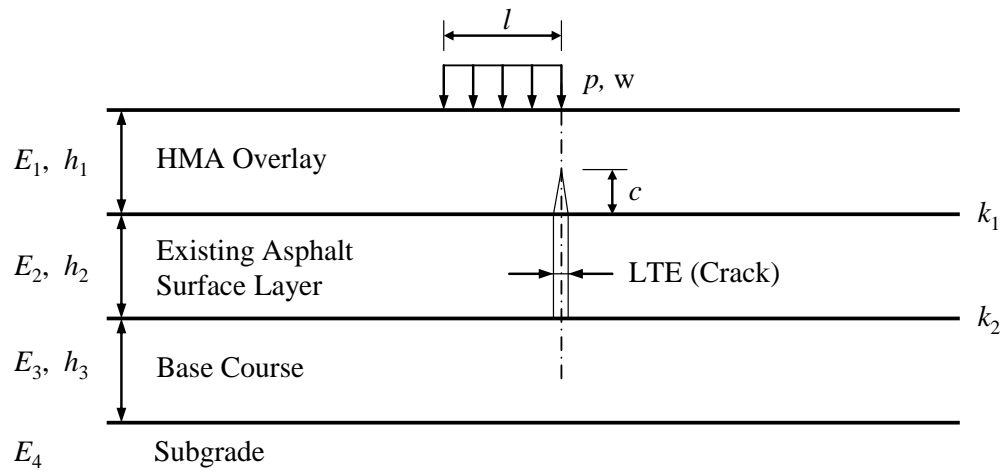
Diagram of HMA overlay on asphalt concrete pavement-shearing.
